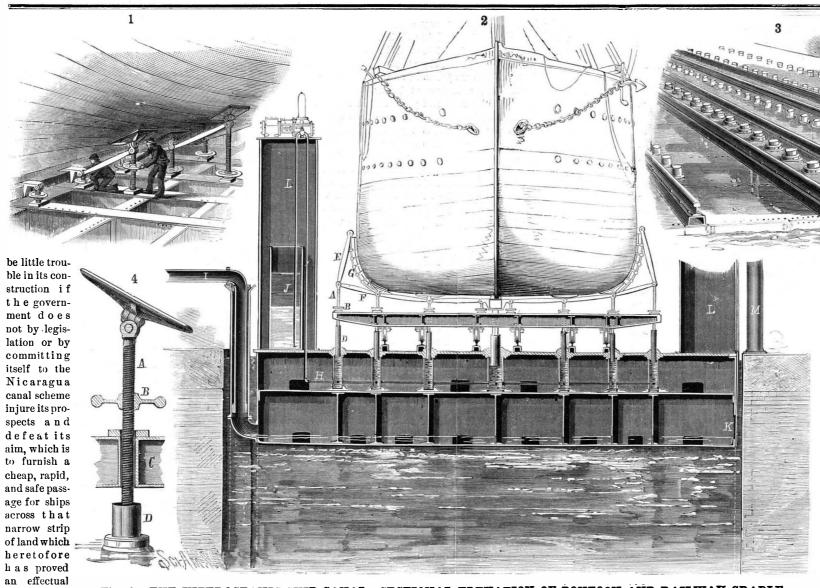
THE INTEROCEANIC SHIP CANAL.—SECTIONAL ELEVATION OF PONTOON AND RAILWAY CRADLE.
